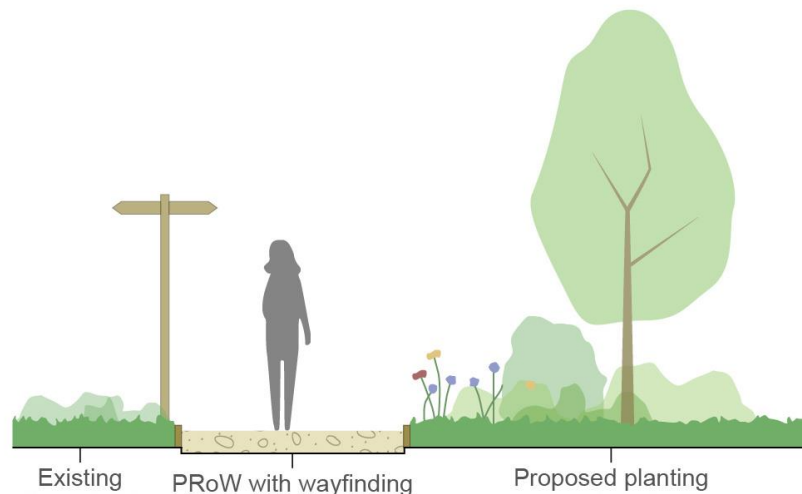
Example of potential additional improvements to the PRoW with views of substation infrastructure
